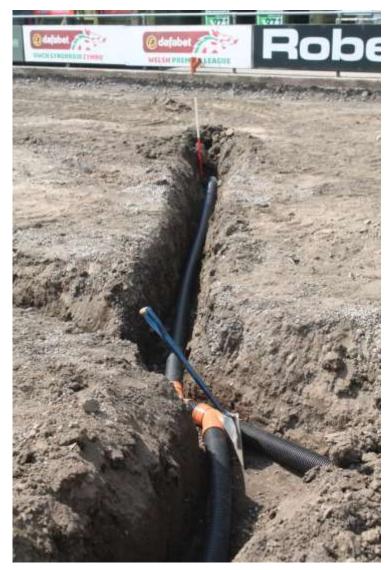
View south along re-excavated drainage trench at northern end of *TB* (Figure 9). 1m scale
